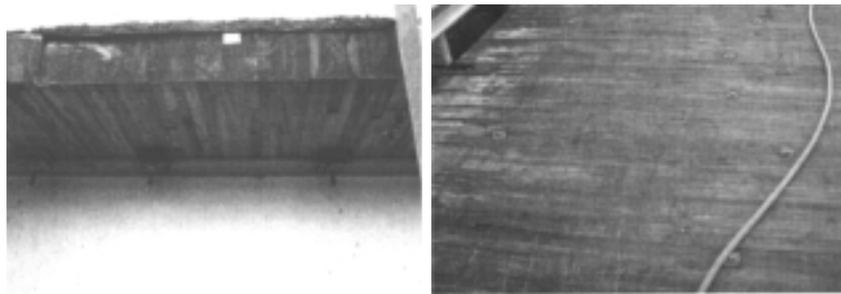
(left). End view of deck panel attached to steel girder with clips.
